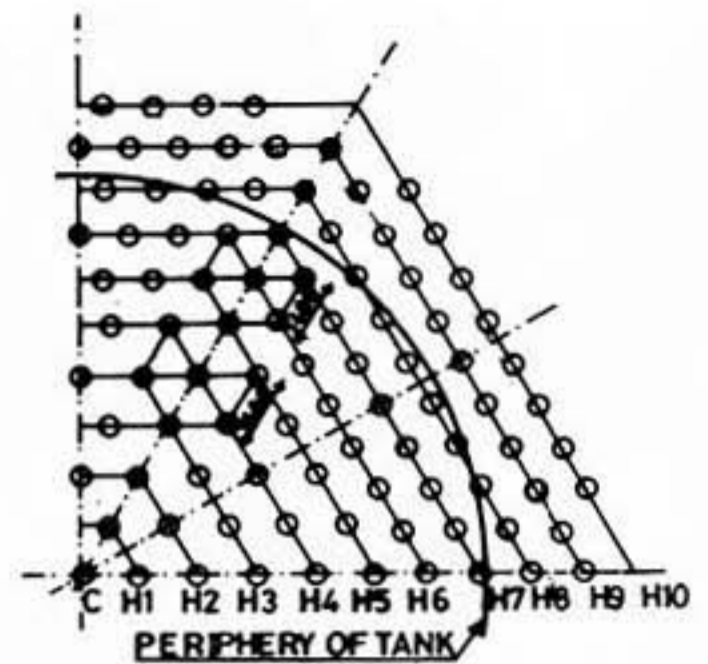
LAYOUT OF STONE COLUMNS FOR 22 m DIA TANK
